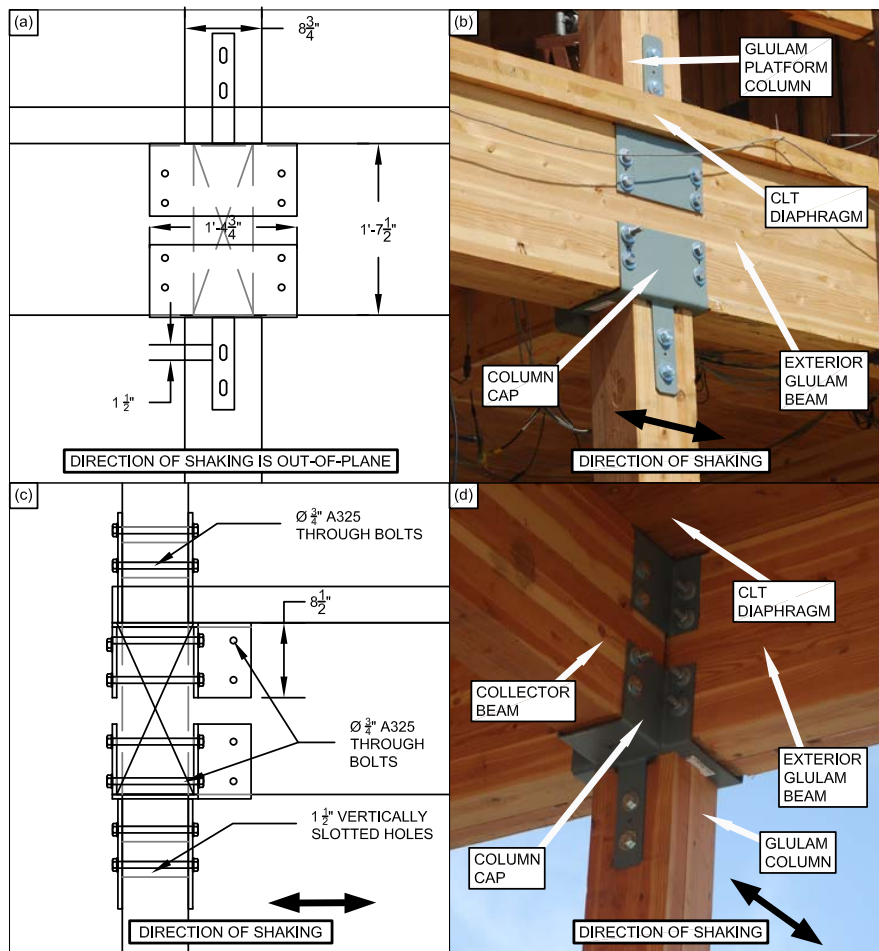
Gravity frame connection joint 4 (a) exterior view schematic (b) exterior view photo (c) side view schematic (d) side view photo
